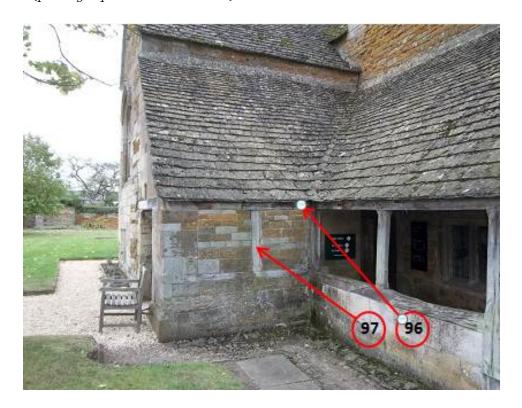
View of the porch to locate sampled timbers (photograph Robert Howard)
